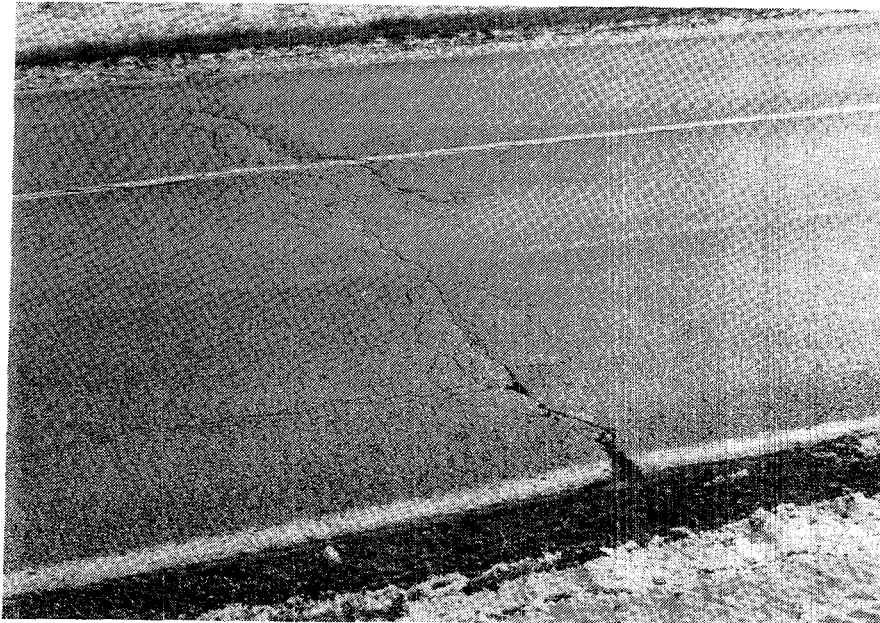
Illustration of transverse cracking of flexible pavement with cement treated base (CTB) with disintegration of the CTB and subsequent cracking of the asphalt concrete surfacing (FLEX-10, Illinois).
